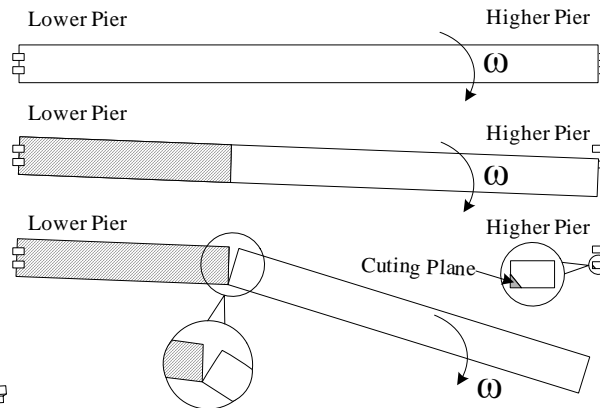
The failure pattern of box girder at collapse scene
